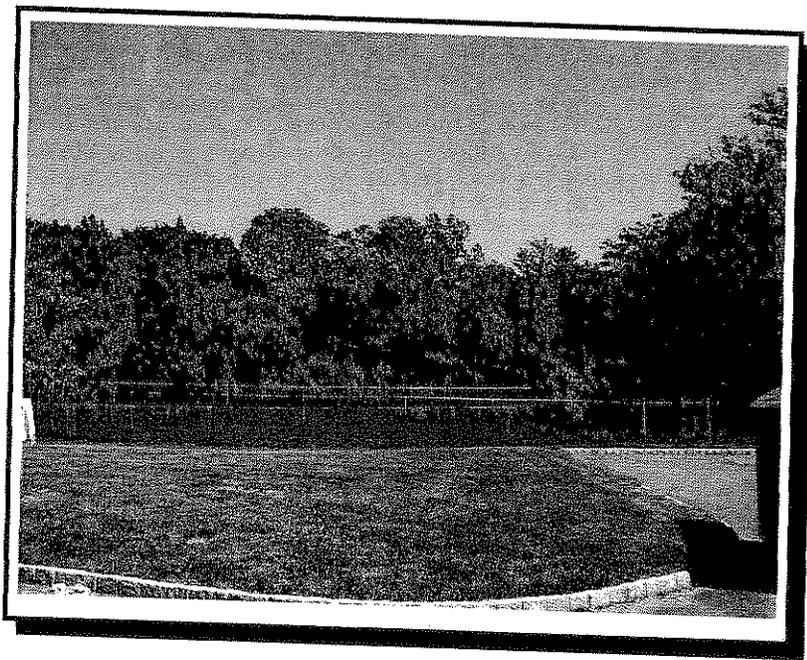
View from site looking south towards detention basis. Note: access road located in foreground. Danforth Road & residential areas located beyond treeline.
